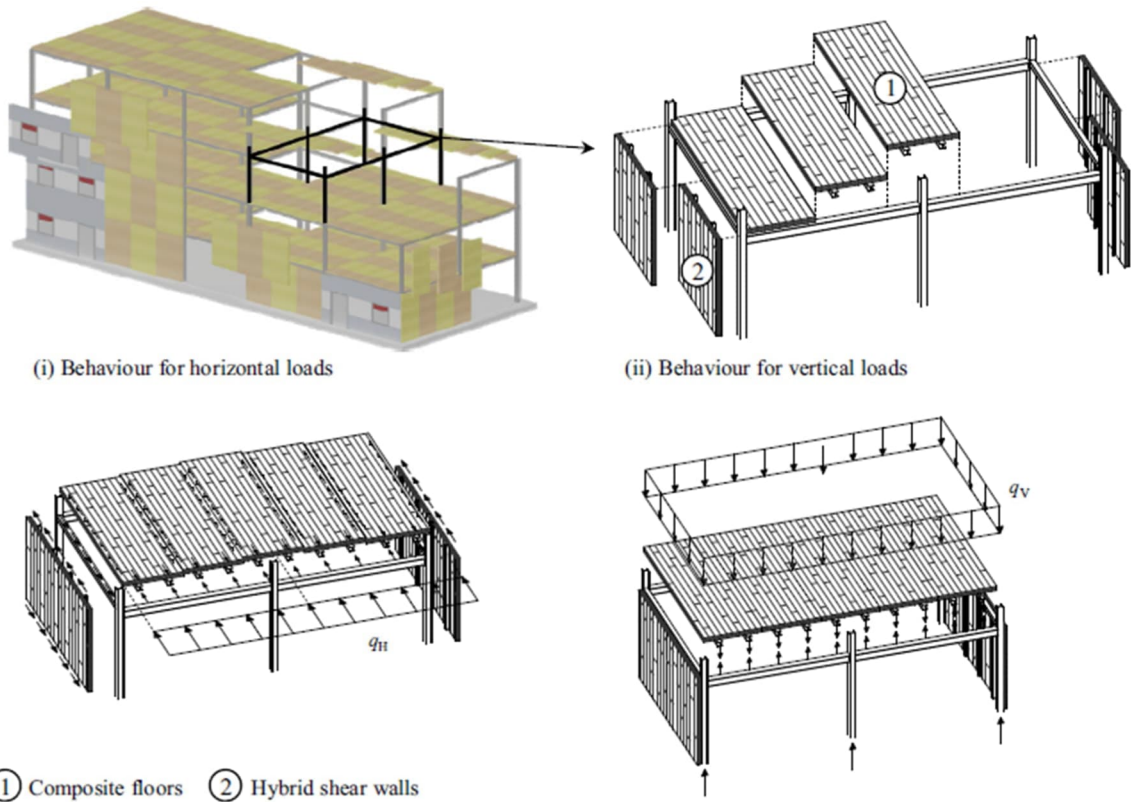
Axonometric view of the building and exploded view of the hybrid structure with load path depicted for the vertical and horizontal loads [54]
